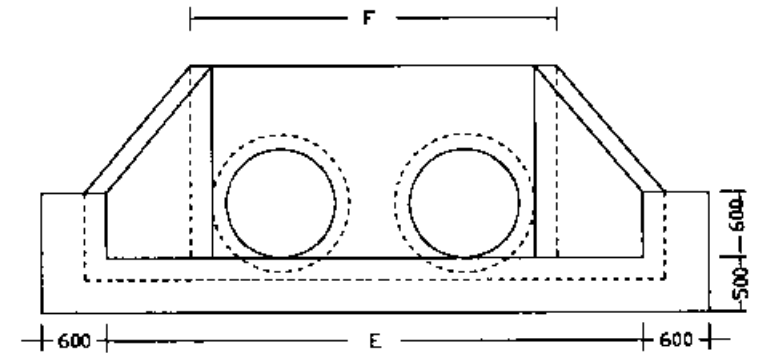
Plan and Profile of Box Culvert (Type A)
